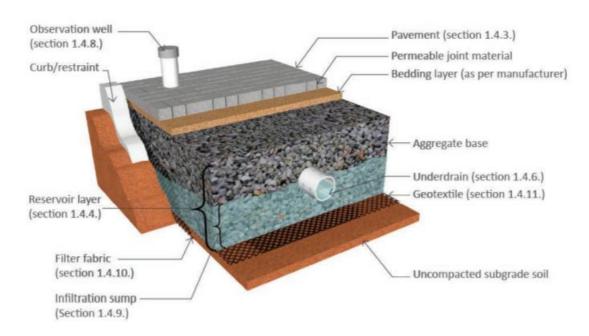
Schematic Profile of Permeable Pavement (Source: TDEC, 2014, MWS edited 2020)
